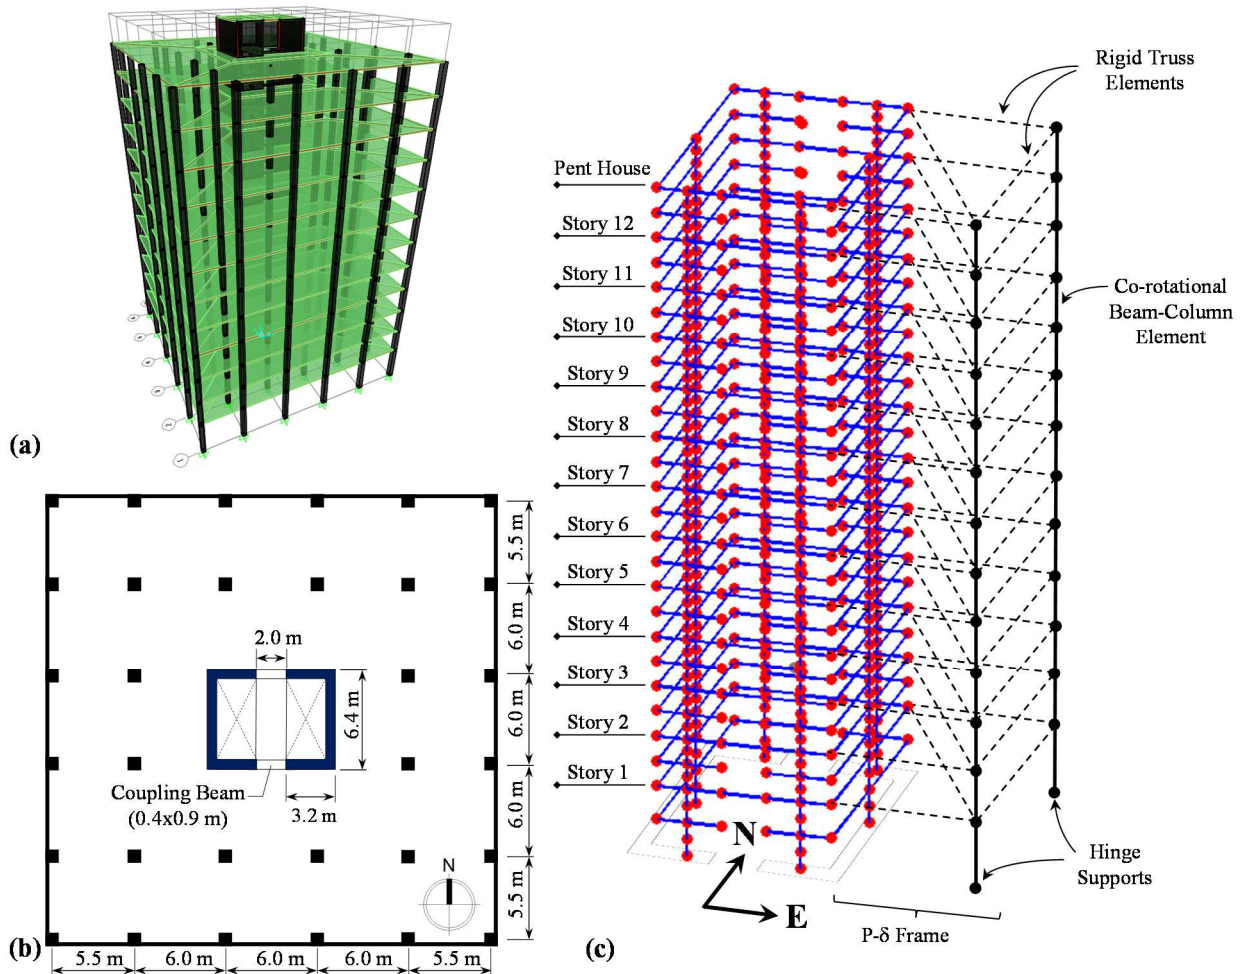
a-b) 3D layout and the plan view of the 12-story building coupled C-shaped RC core, c) Wide Column Model for the 12-story core wall.
